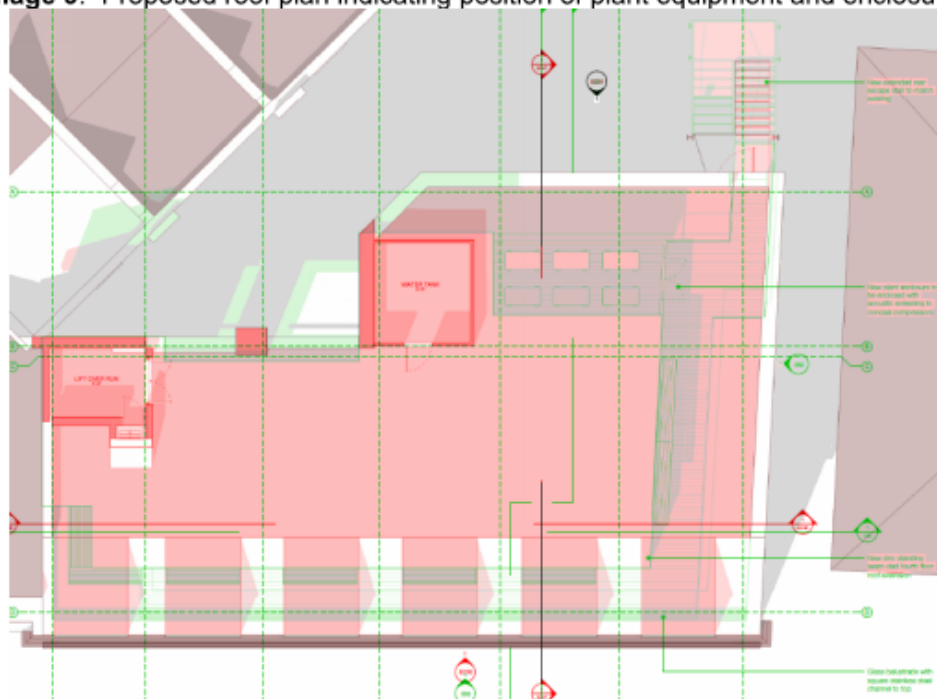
Overlay showing the extent of the existing structures on the roof top and the extent of the proposed roof extension, plant enclosure and extension to staircase.
